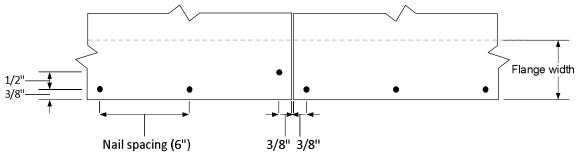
Boundary nails for nail spacing of 6 inches o.c. (not to scale)
